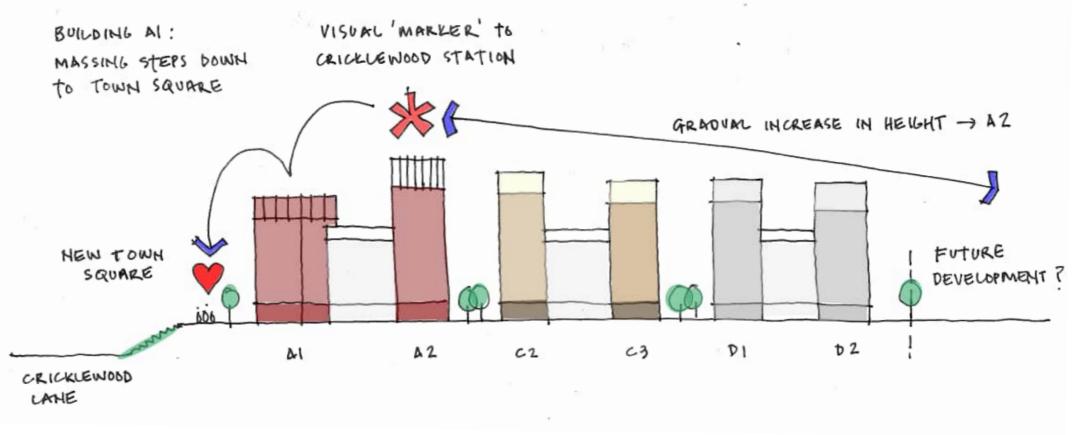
Diagramatic elevation along the railway showing the revised massing strategy and elevational strategy of the Application Scheme.
